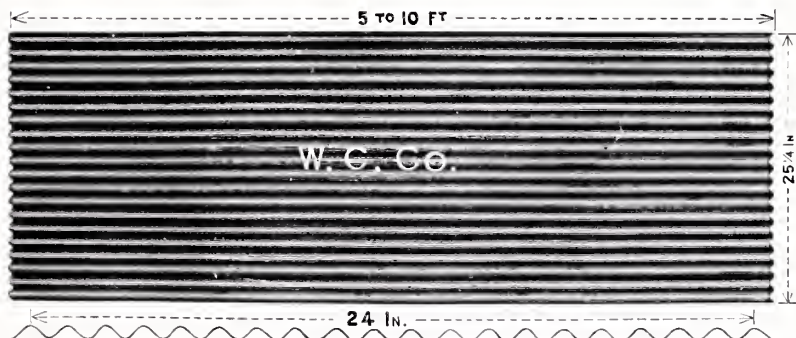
Shows our $1\frac{1}{4}$ inch Corrugated Sheets used for Ceiling, Roofing, Siding, Shutters, interior decorations &c.
